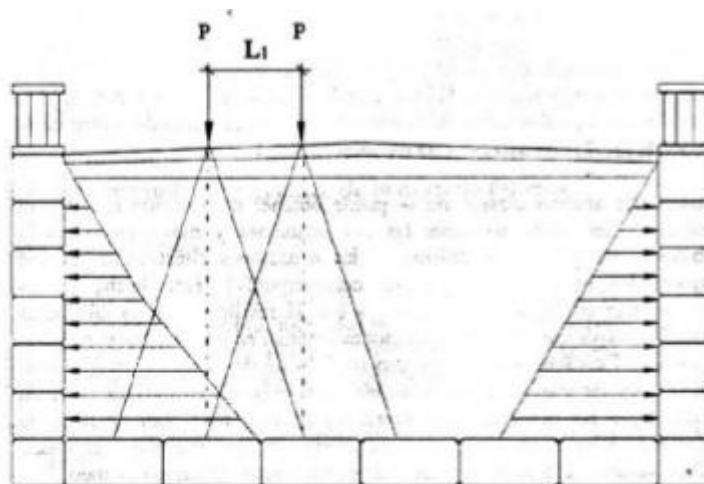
bridge cross section and schematic load distribution (Gutierrez, H., 2001).
